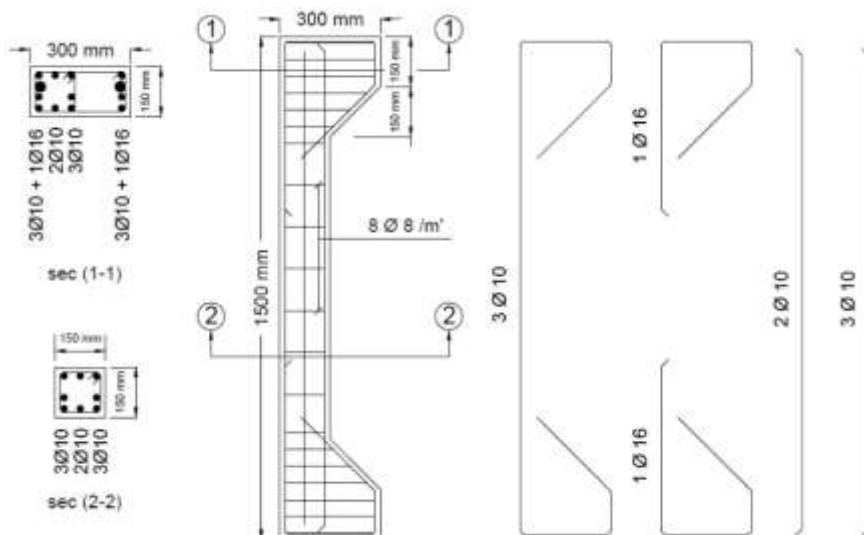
c: Layout of S6 showing the details of dimensions and reinforcement
